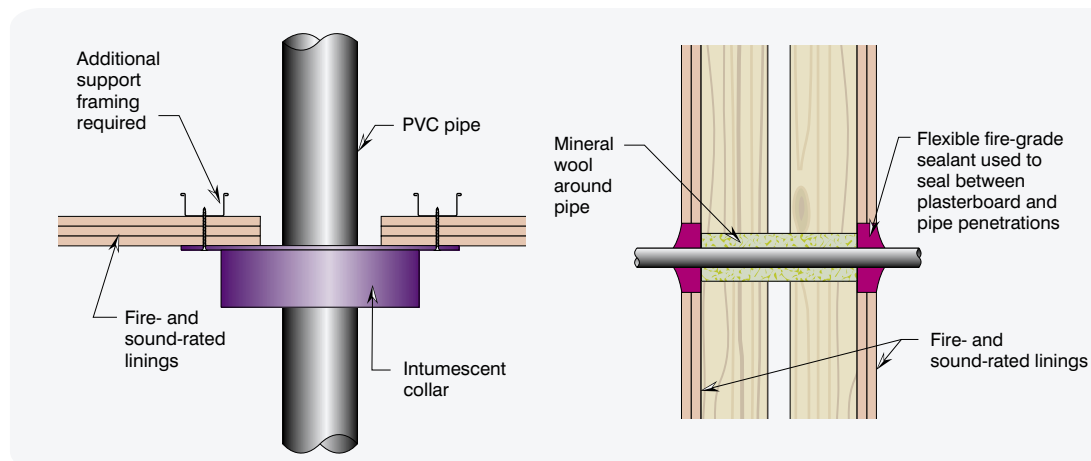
Plumbing service penetration in fire- and sound-rated wall and floor/ceiling – elevation view.
